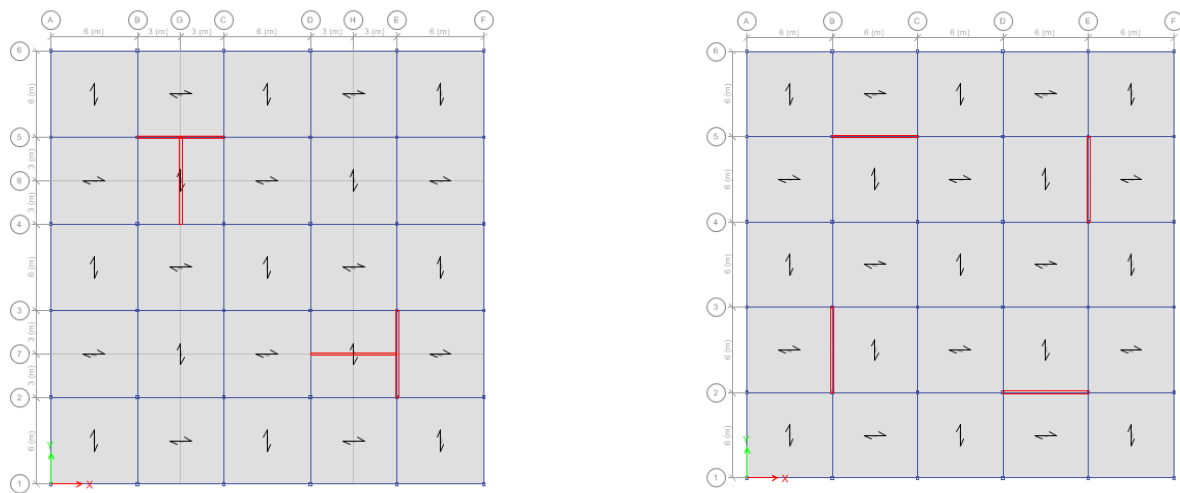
Placement of rectangular and T-shaped shear walls in the plan of a 10-story building.
